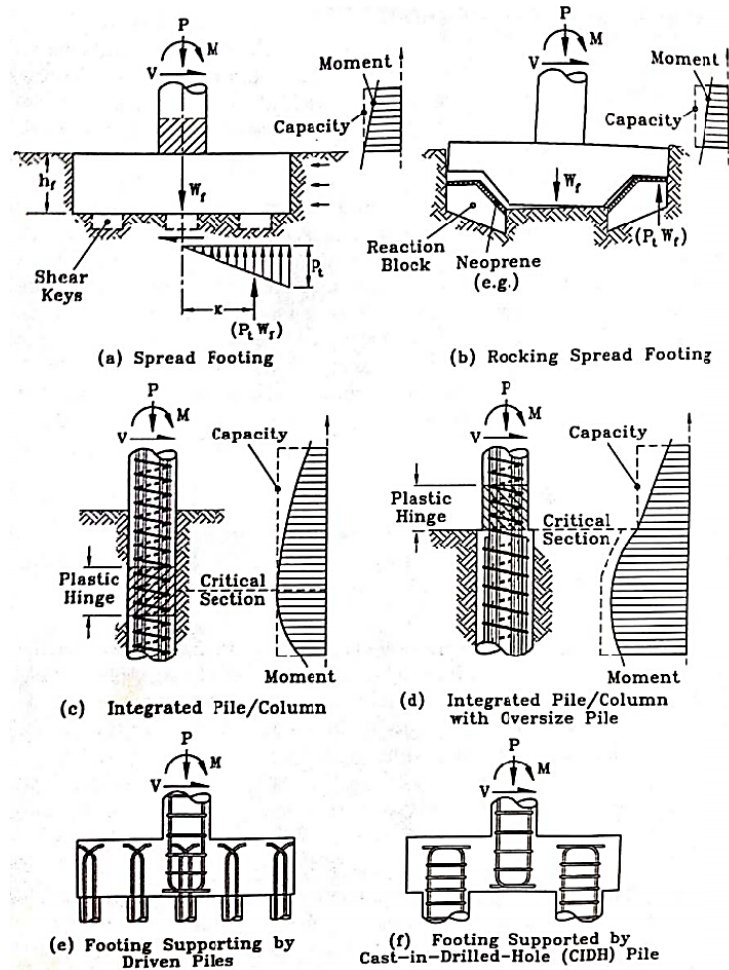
Bridge foundation systems (Source: (Priestley, et al., 1996))
